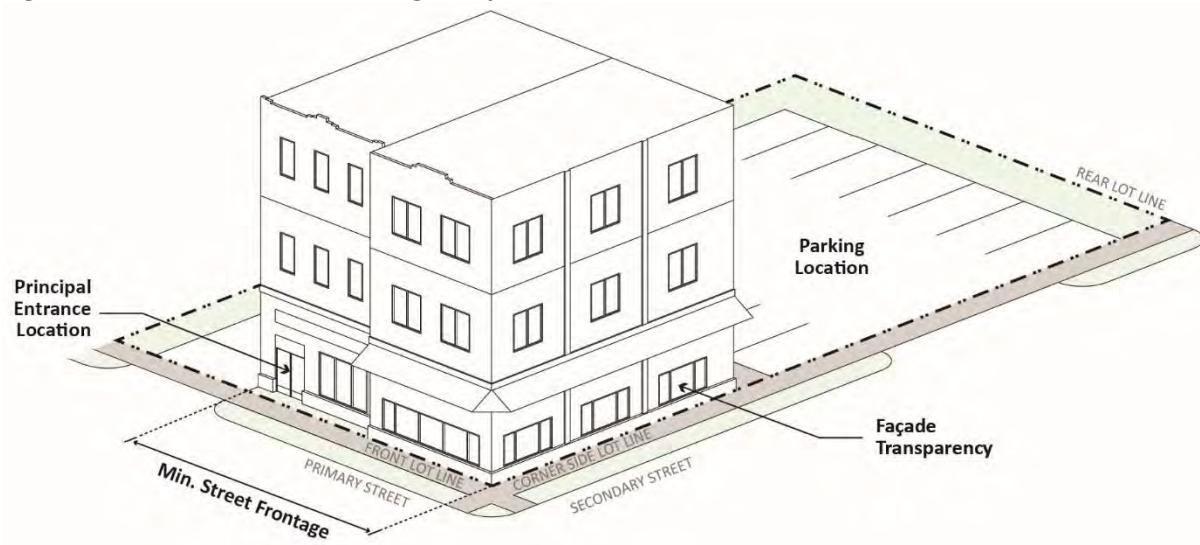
Commercial Design Requirements: 3-D View
